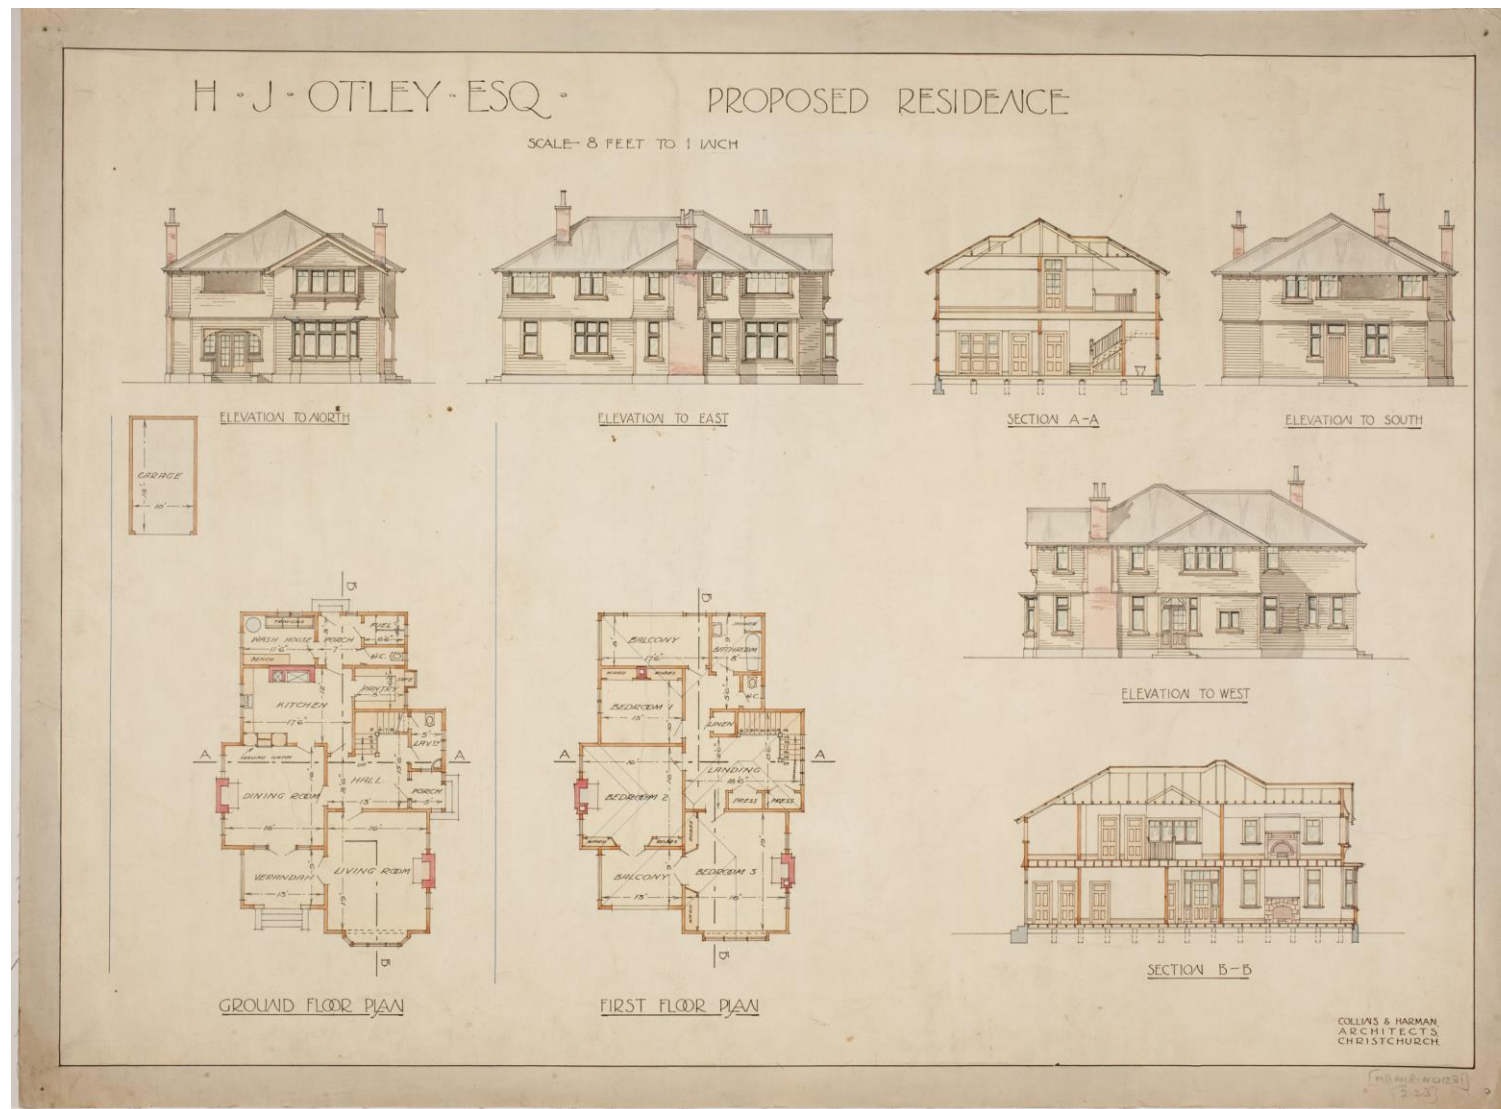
Collins and Harman, H. J. Otley, Esq., Proposed Residence, plans, elevations and sections (1923).
